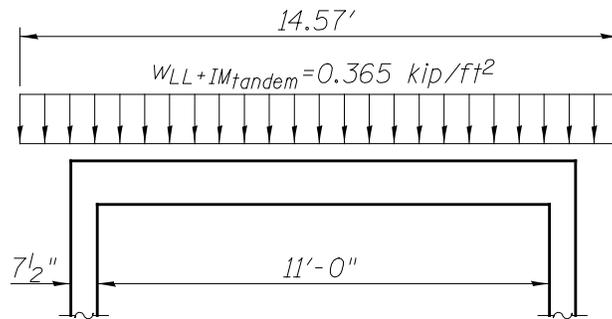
Worked Example 5 – Tandem Load (1 Lane)
